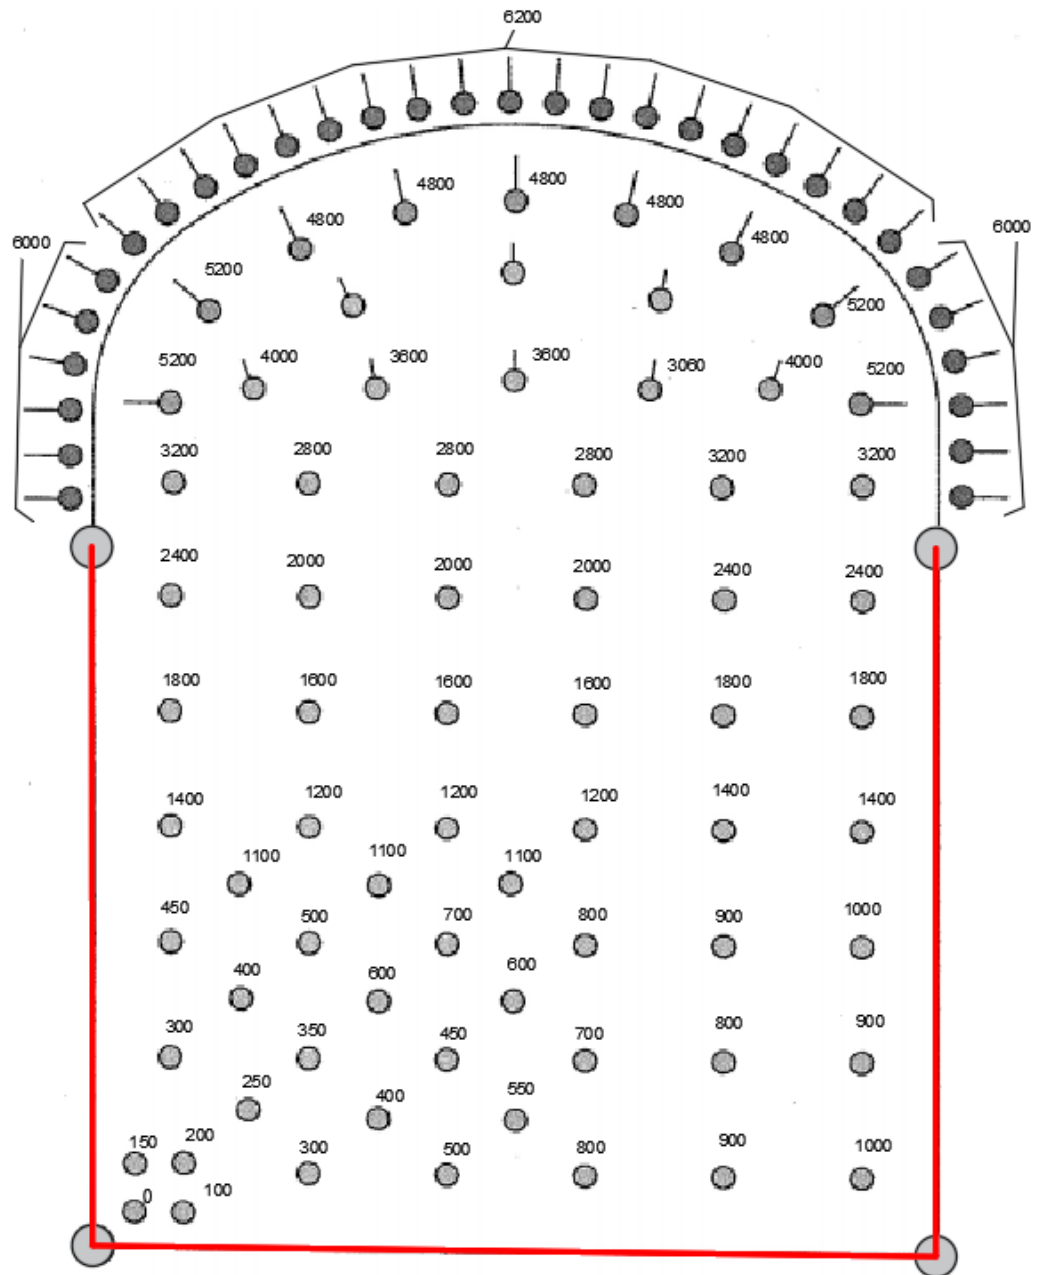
Drilling and charging plan that was used in Krångede. The red line illustrates the wire sawn floor and sidewalls.
